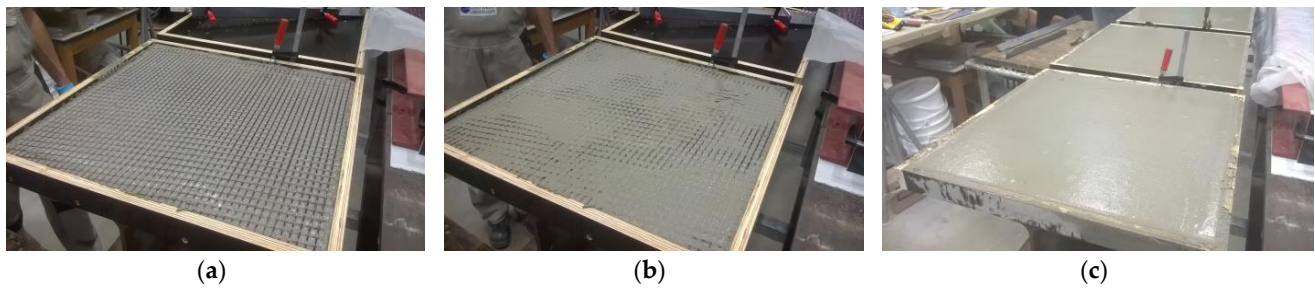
Manufacturing of test specimens. (a) Fabric embedded in fine concrete (15 mm thickness), (b) fabric pressed into fine concrete, and (c) test specimen filled with fine concrete (15 mm thickness) and smoothed (Hering [1]).
